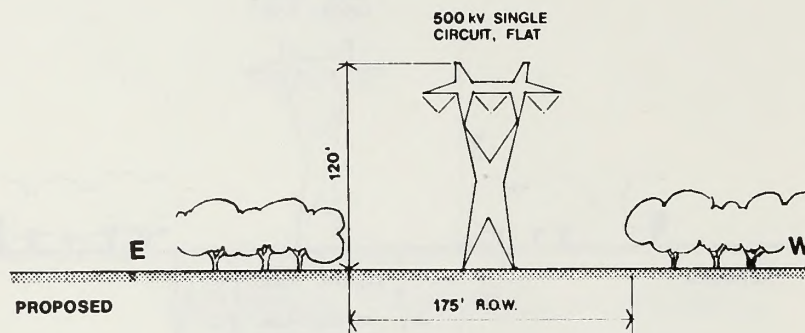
TYPICAL CORRIDOR IN THE RAMSEY CANYON-MERIDIAN SUBSTATION SEGMENT OF PREFERRED ALTERNATIVE
